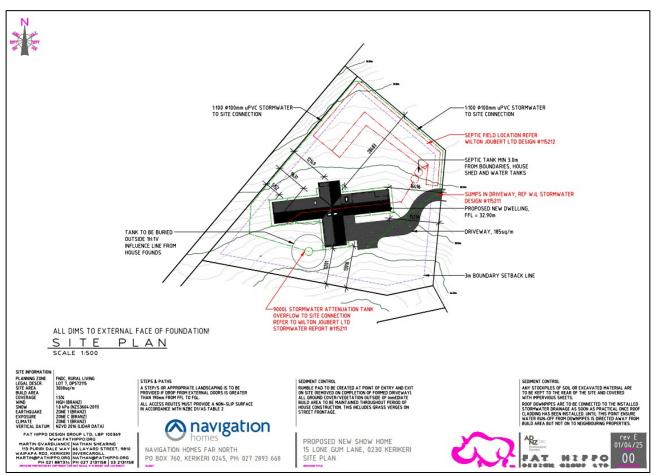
Snip of Proposed Site Plan Provided by Fat Hippo Design Group Ltd (dated: 01.04.2025)
